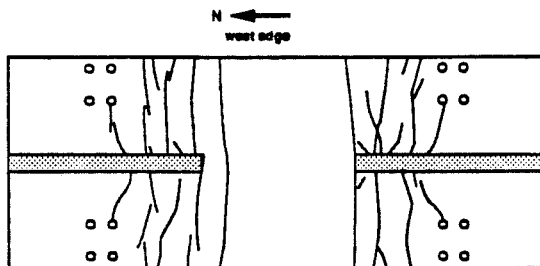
Sp. 2a: Progression of Cracking of Bottom Face of Roof Slab at End of Test
